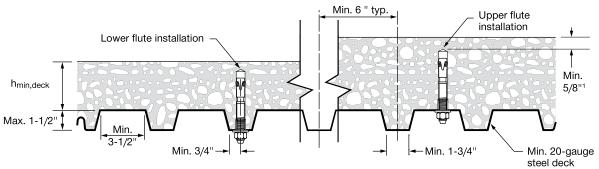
Installation of Hilti KB-TZ2 carbon steel in the soffit of concrete over metal deck floor and roof assemblies - B deck
